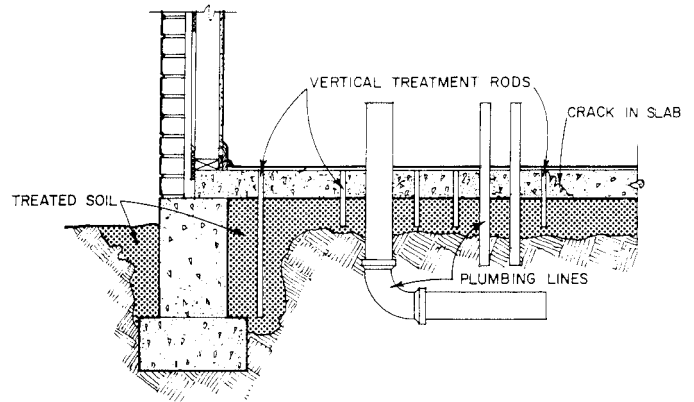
Treatment under concrete with vertical drilling at joints, cracks and openings, and around plumbing.
